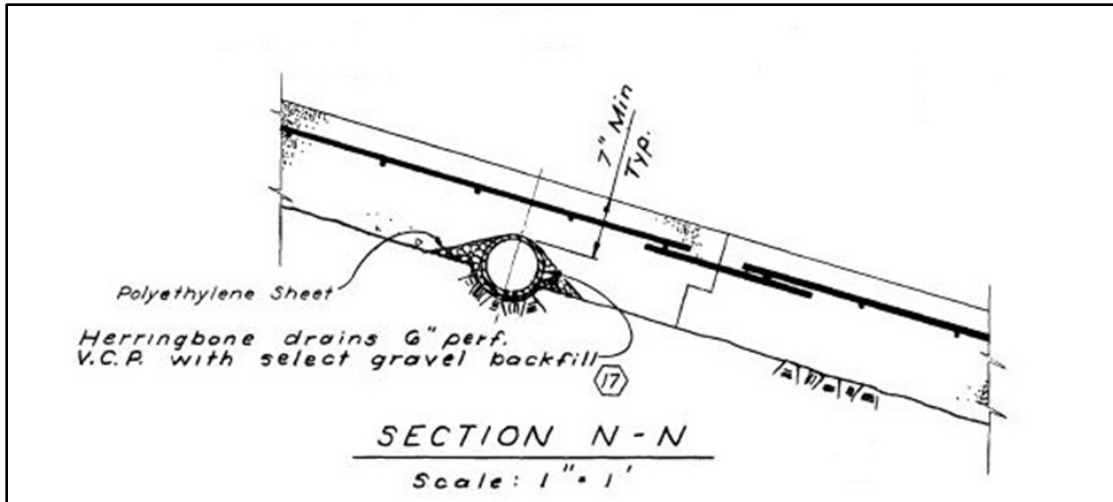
Herringbone drain VCP pipe protruding into slab section [5]
